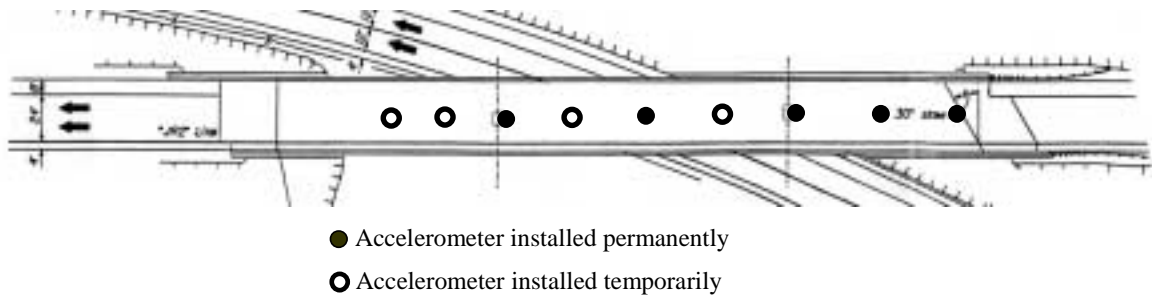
Accelerometer Arrangement at Jamboree Road Overcrossing; Plan
